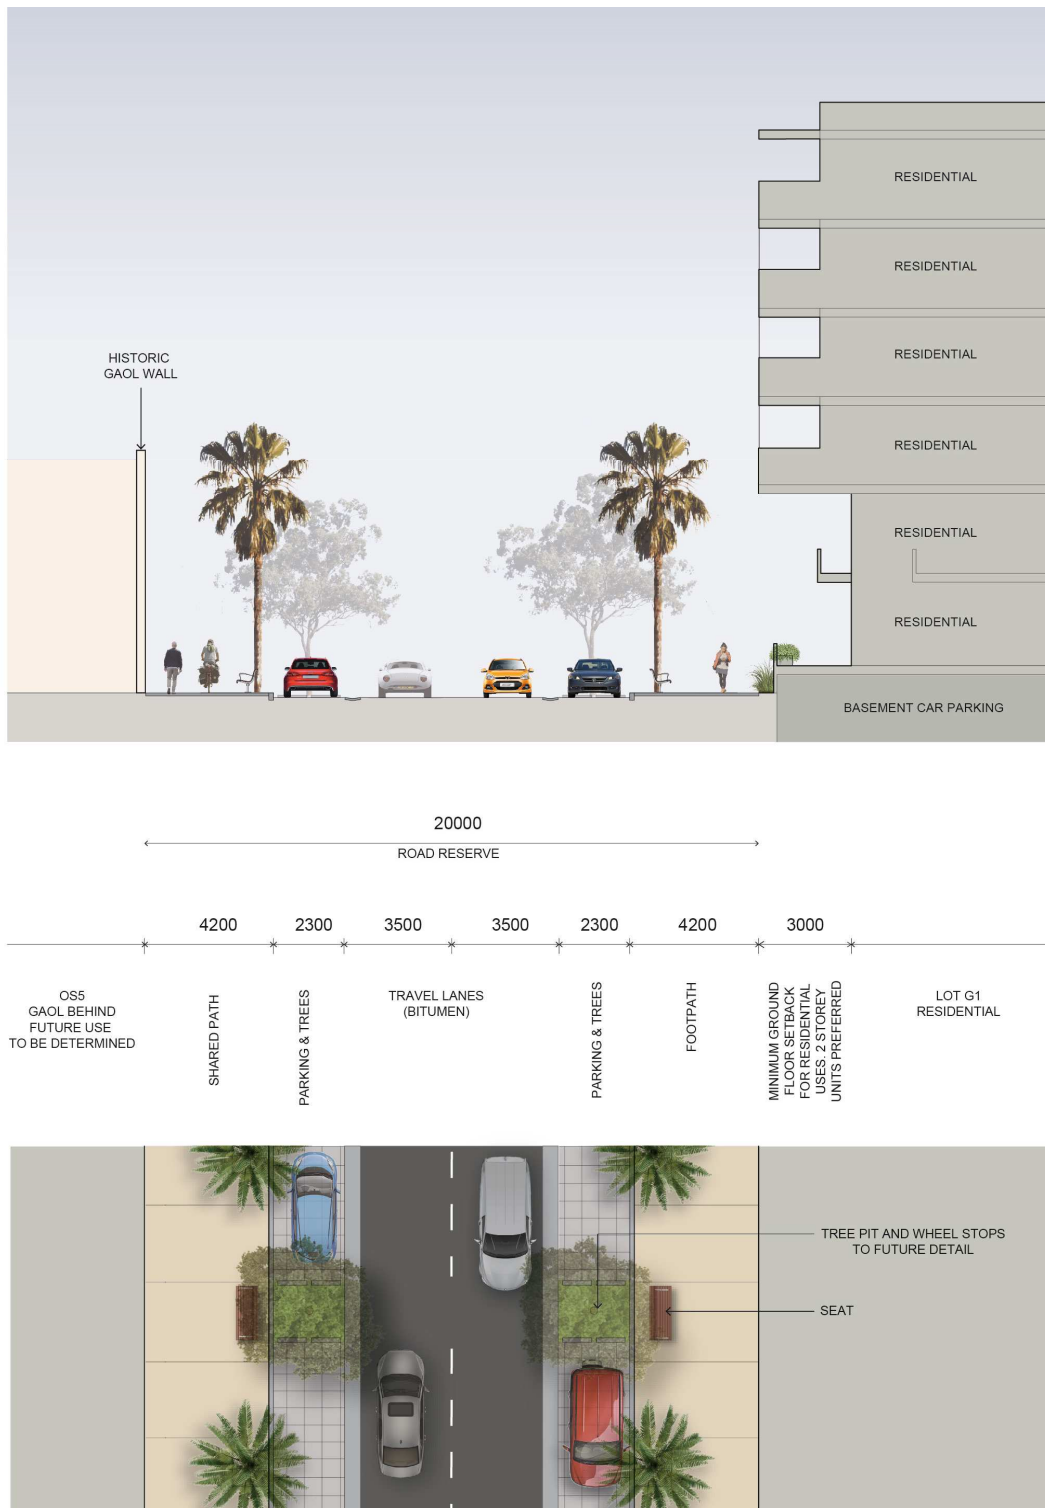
Typical street section 3 – Dunlop Street
